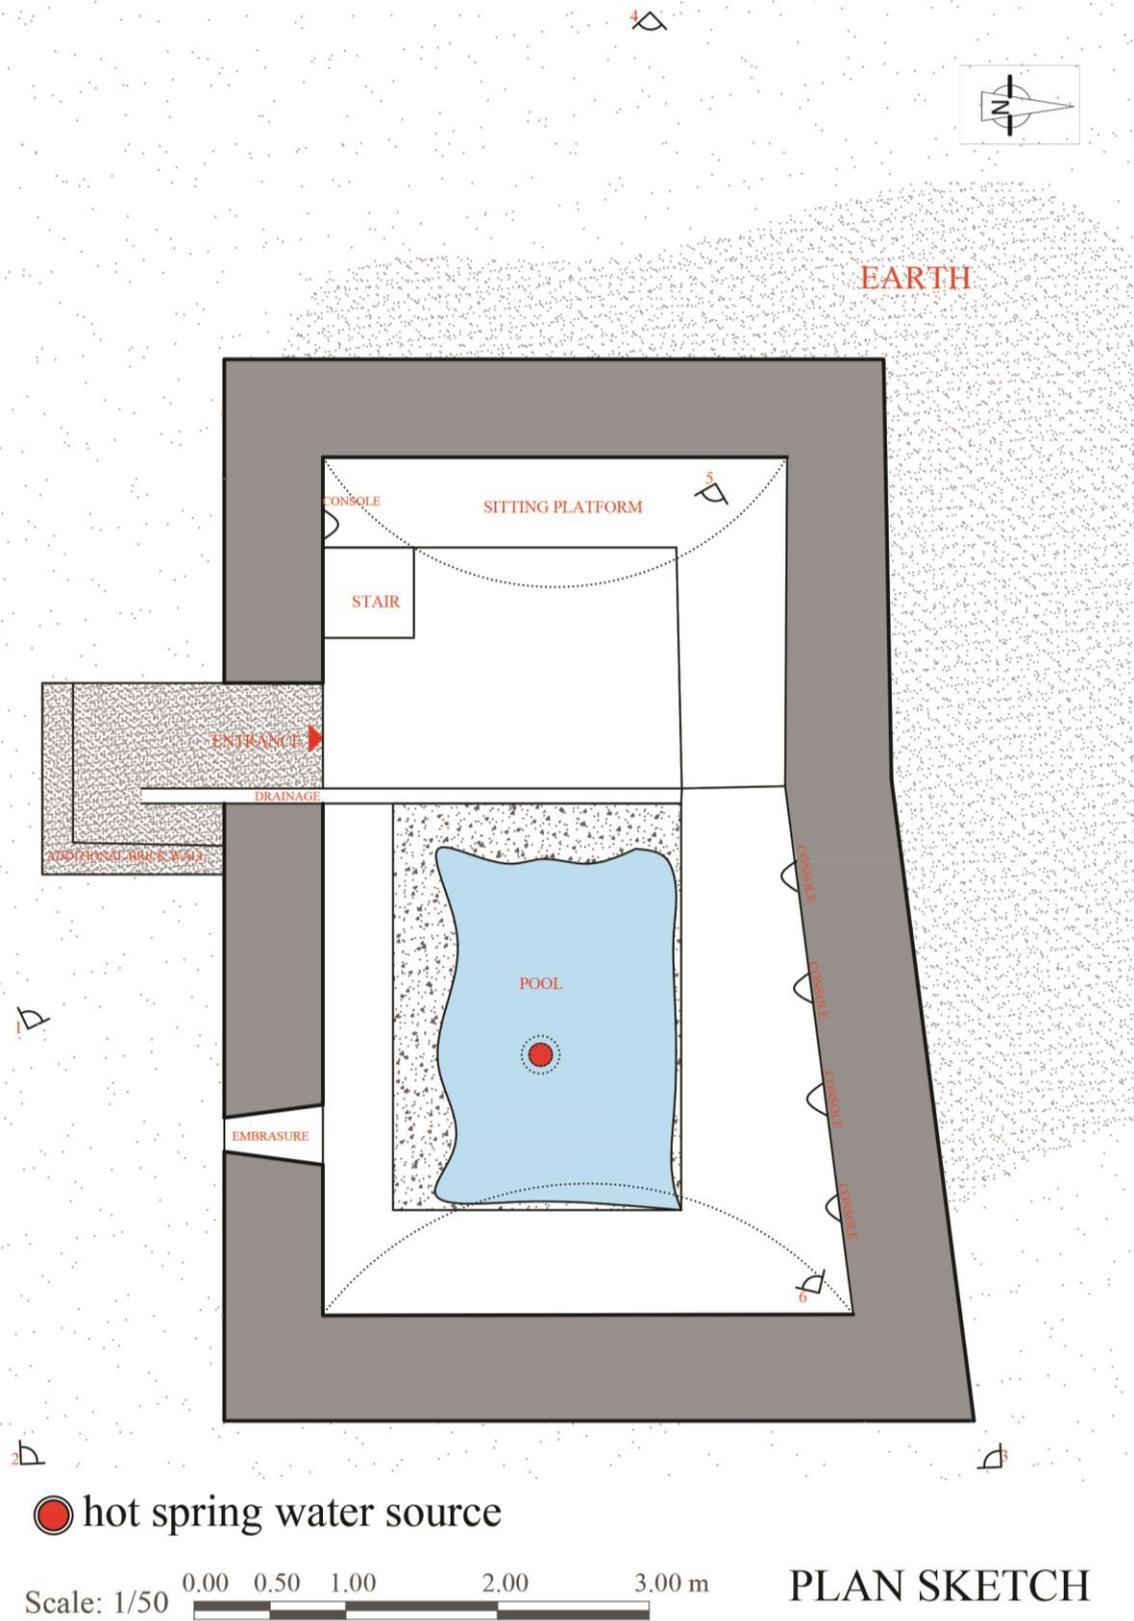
Karakoç Thermal Spring Bath A, Plan Sketch
